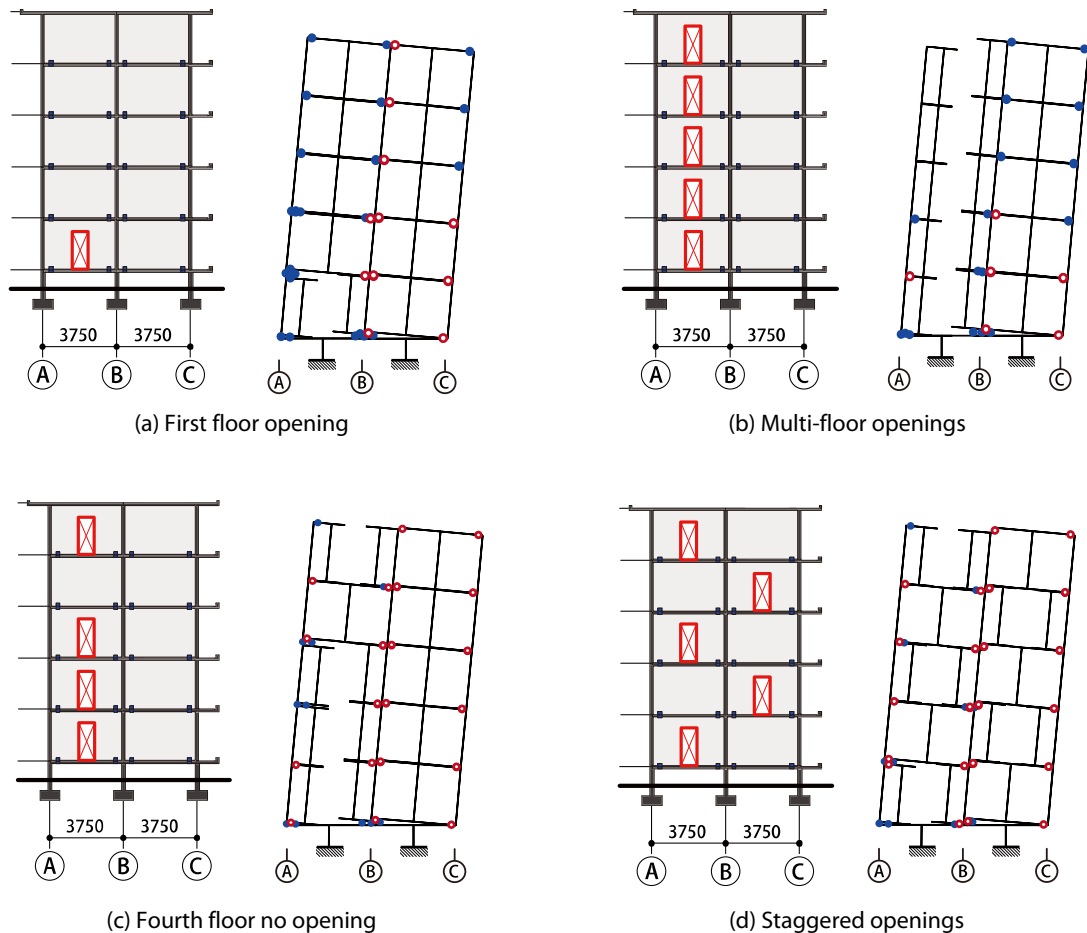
New openings in Frame 5 (and 9) and deformed shape ($R=1.0\%$)
